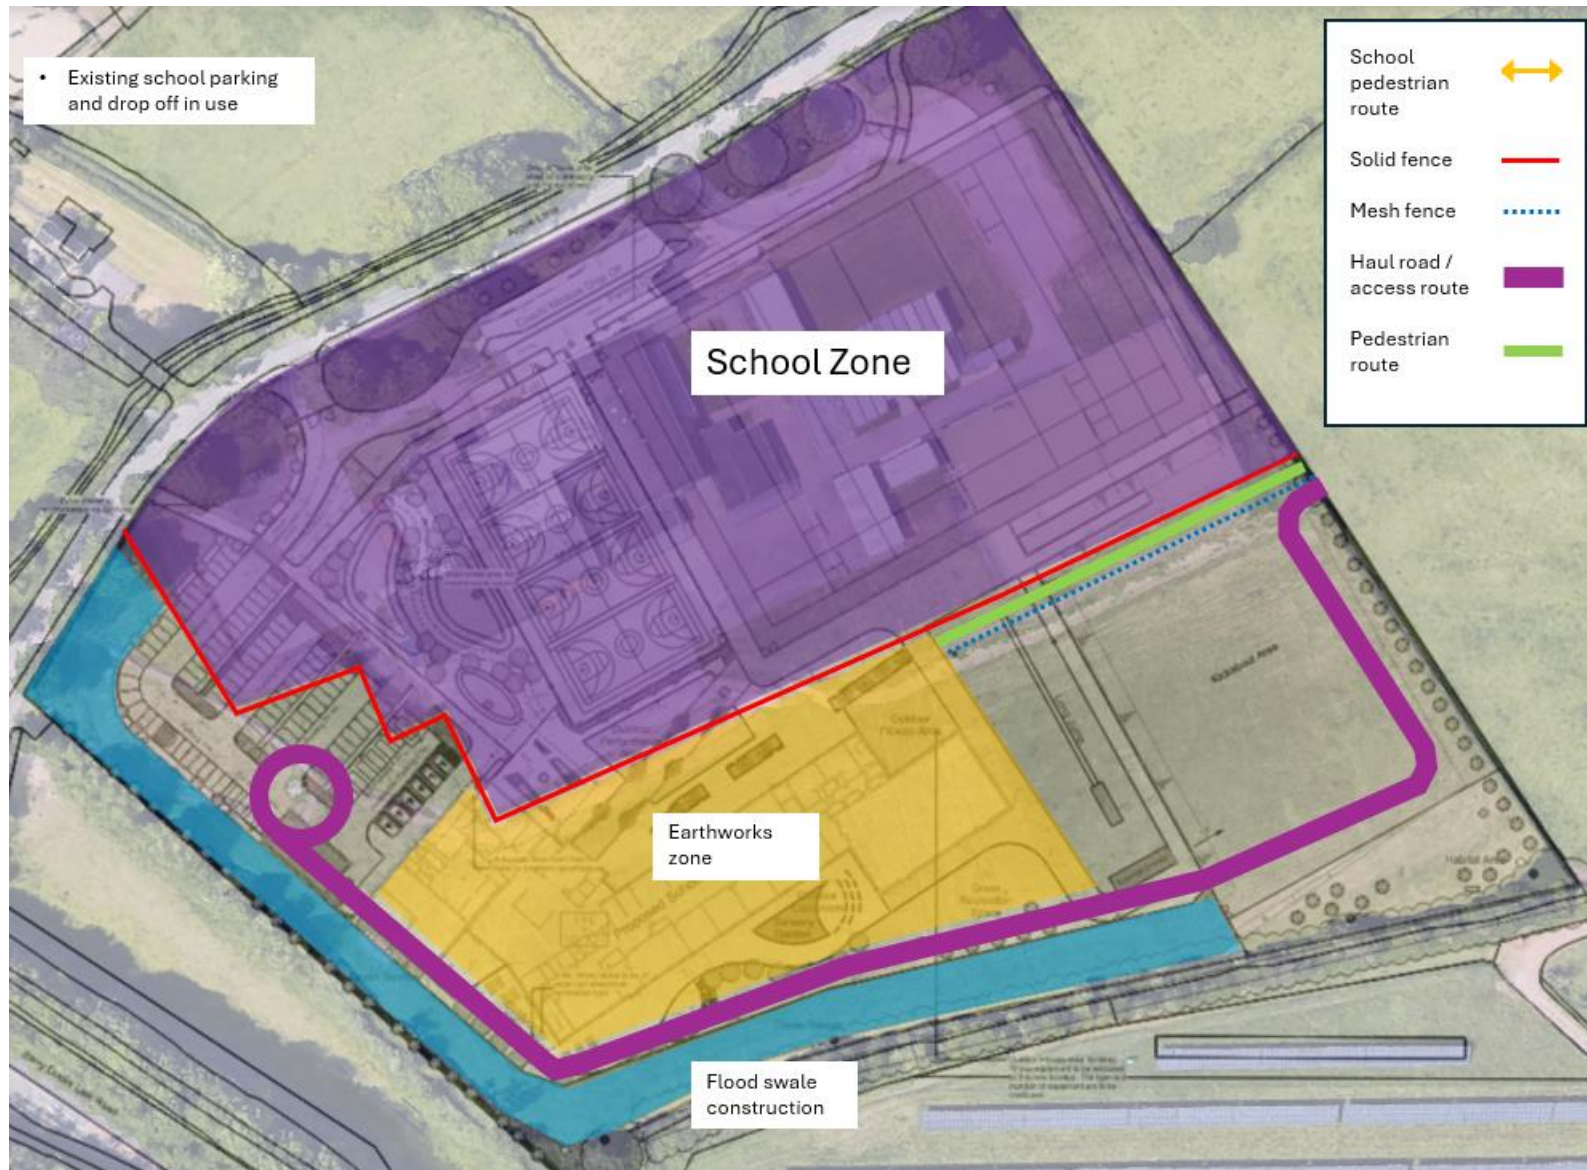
Site Logistics Plan for flood alleviation and earthworks
